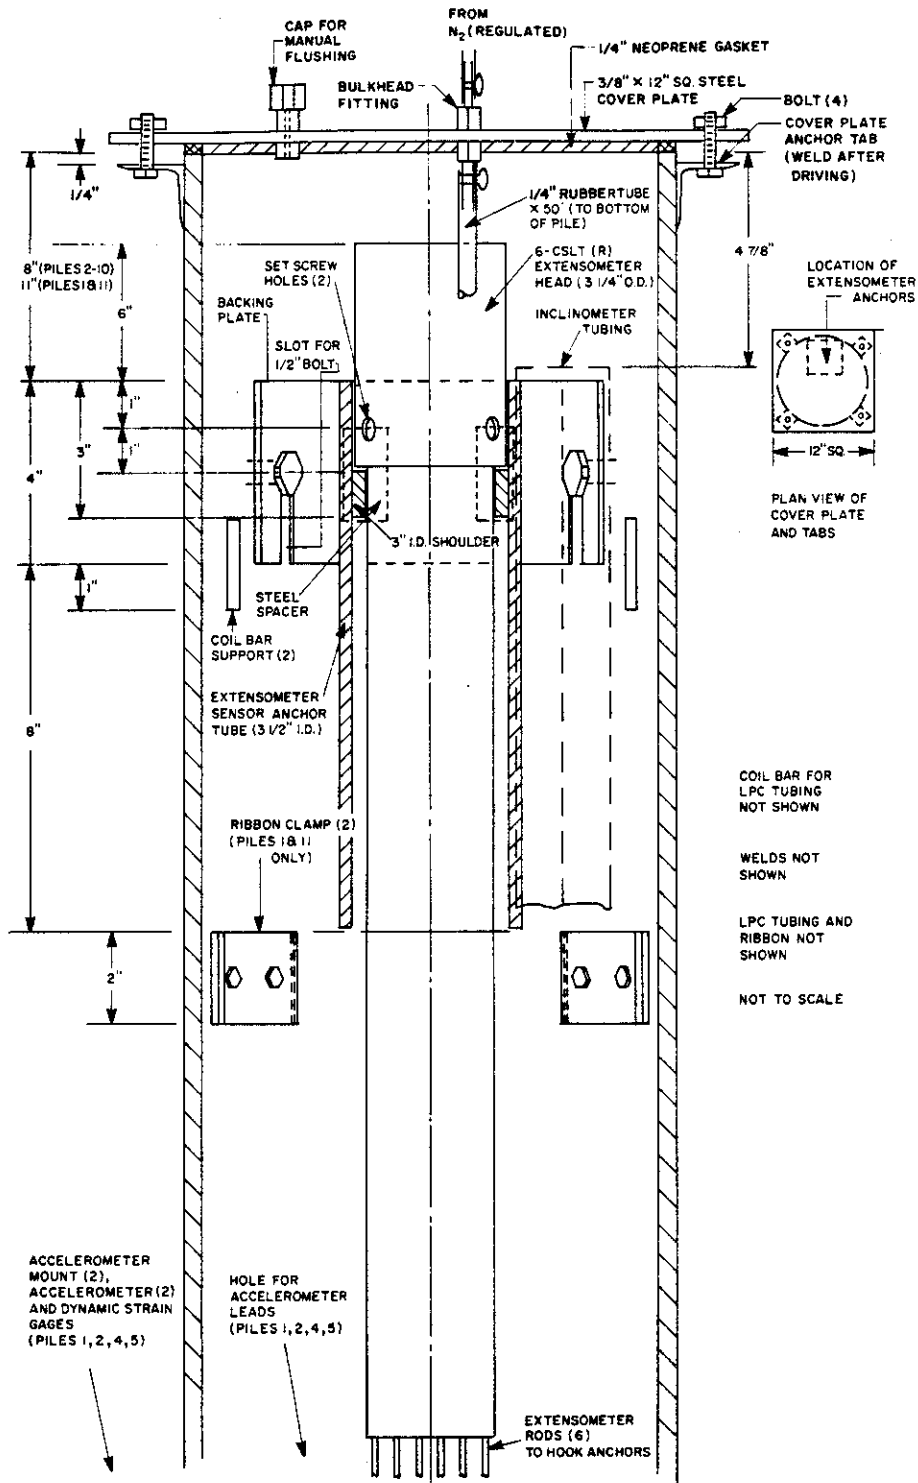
DETAIL OF EXTENSOMETER HEAD MOUNTING (1 in = 25.4 mm)
